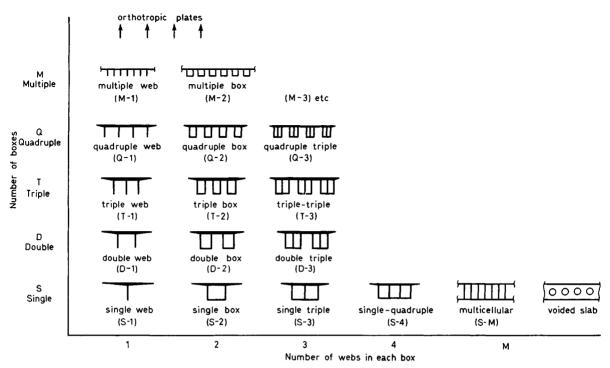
Classification of bridge-deck classifications. (After Lee (1971) 'The selection of box-beam arrangements in bridge design', *Developments in bridge design and construction*. (Crosby Lockwood).
